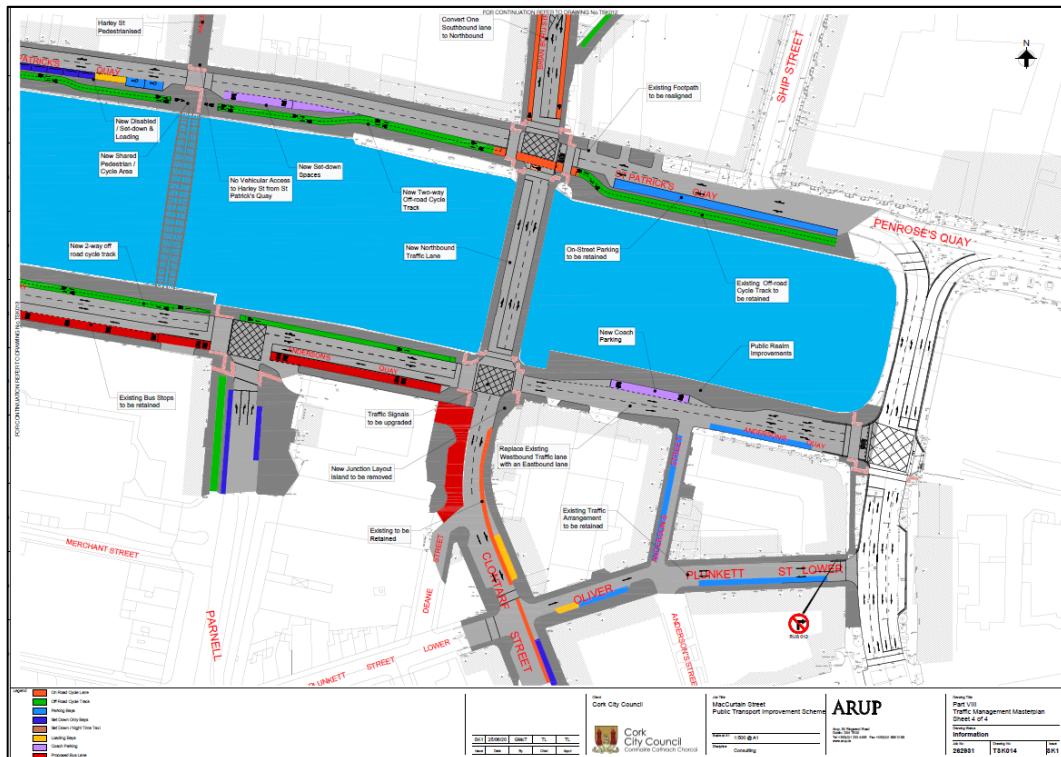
Street improvement works – Sheet 4 of 4 | Not to Scale
